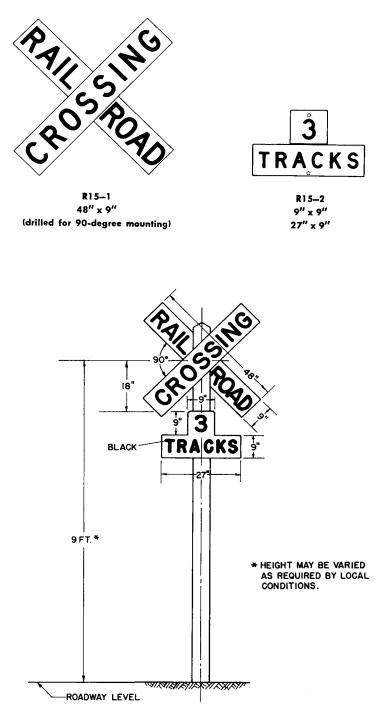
Railroad-highway crossing (crossbuck) sign.
